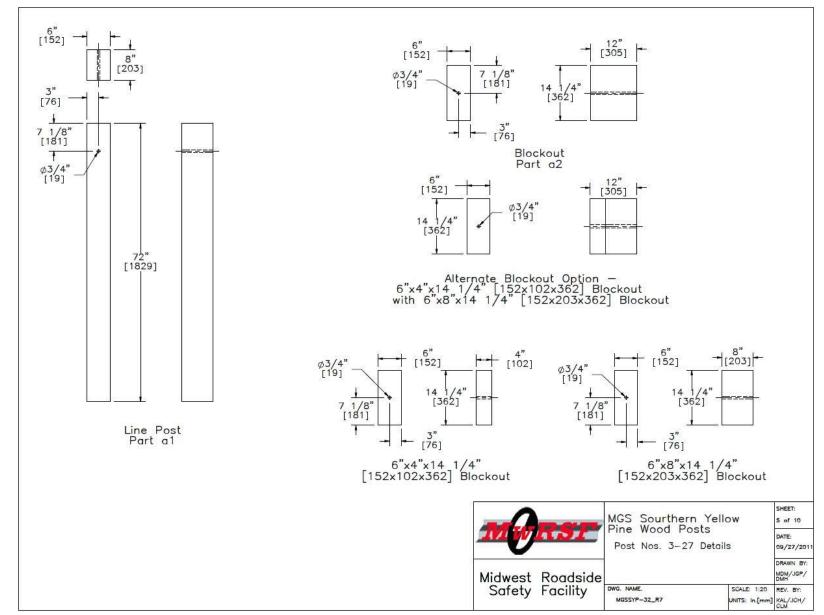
Post nos. 3 through 27 and Blockout Details, Test No. MGSSYP-2
